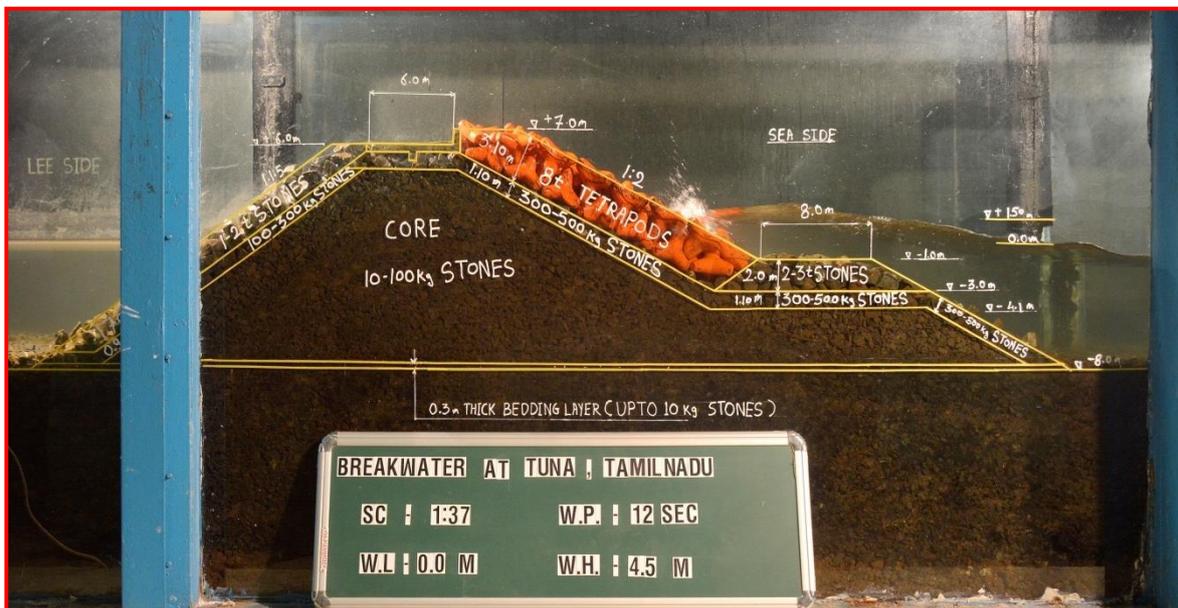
Wave action on armour layer of breakwater consisting of 8 t tetrapods at -8.0 m bed level with 0.0 m water level and 4.5 m wave height
